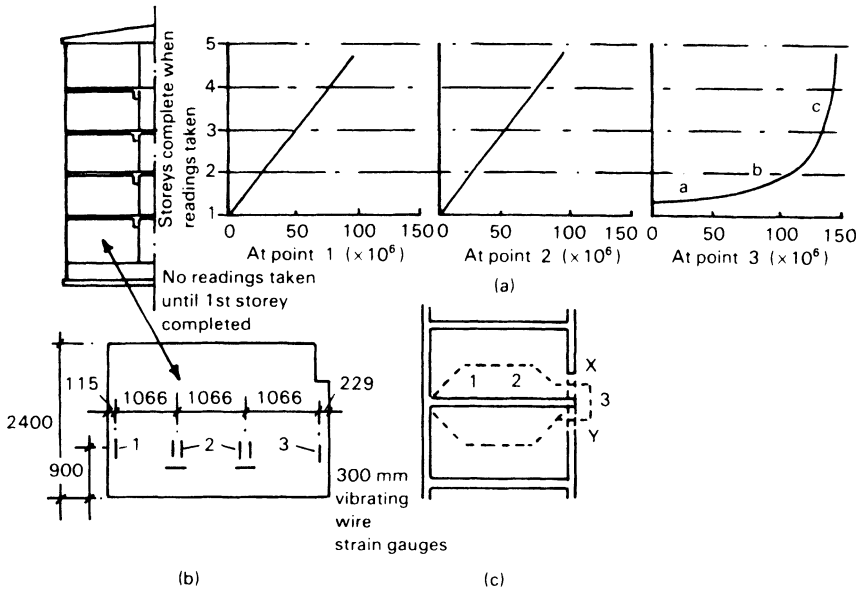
Strain measurements in a cross-wall building: (a) recorded change in strain in first-floor wall; (b) location of strain gauges (same layout on opposite face); (c) estimated tributary floor area supported
